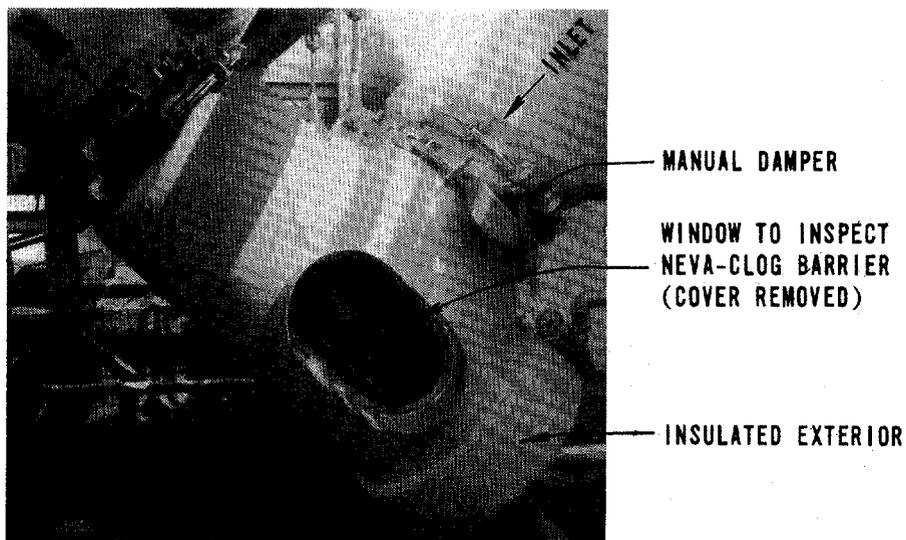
Exterior View of Typical Fire Barrier With Inspection Window Uncovered.
